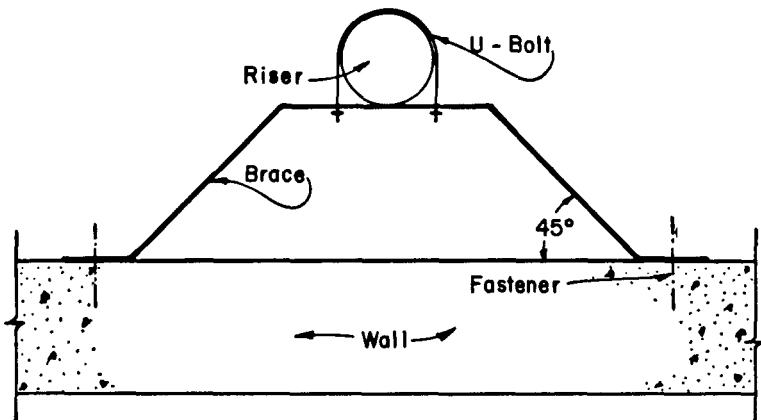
(h) Detail of Four-Way Brace at Riser
